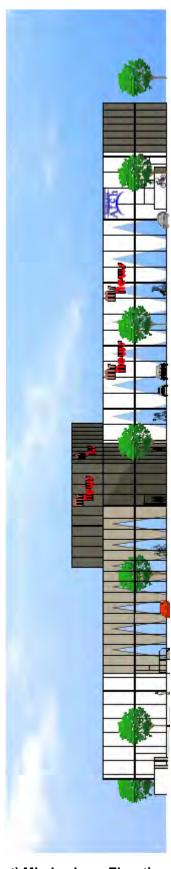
Revised (Current) Minden Lane Elevation (North Eastern) (8.6.2015)
